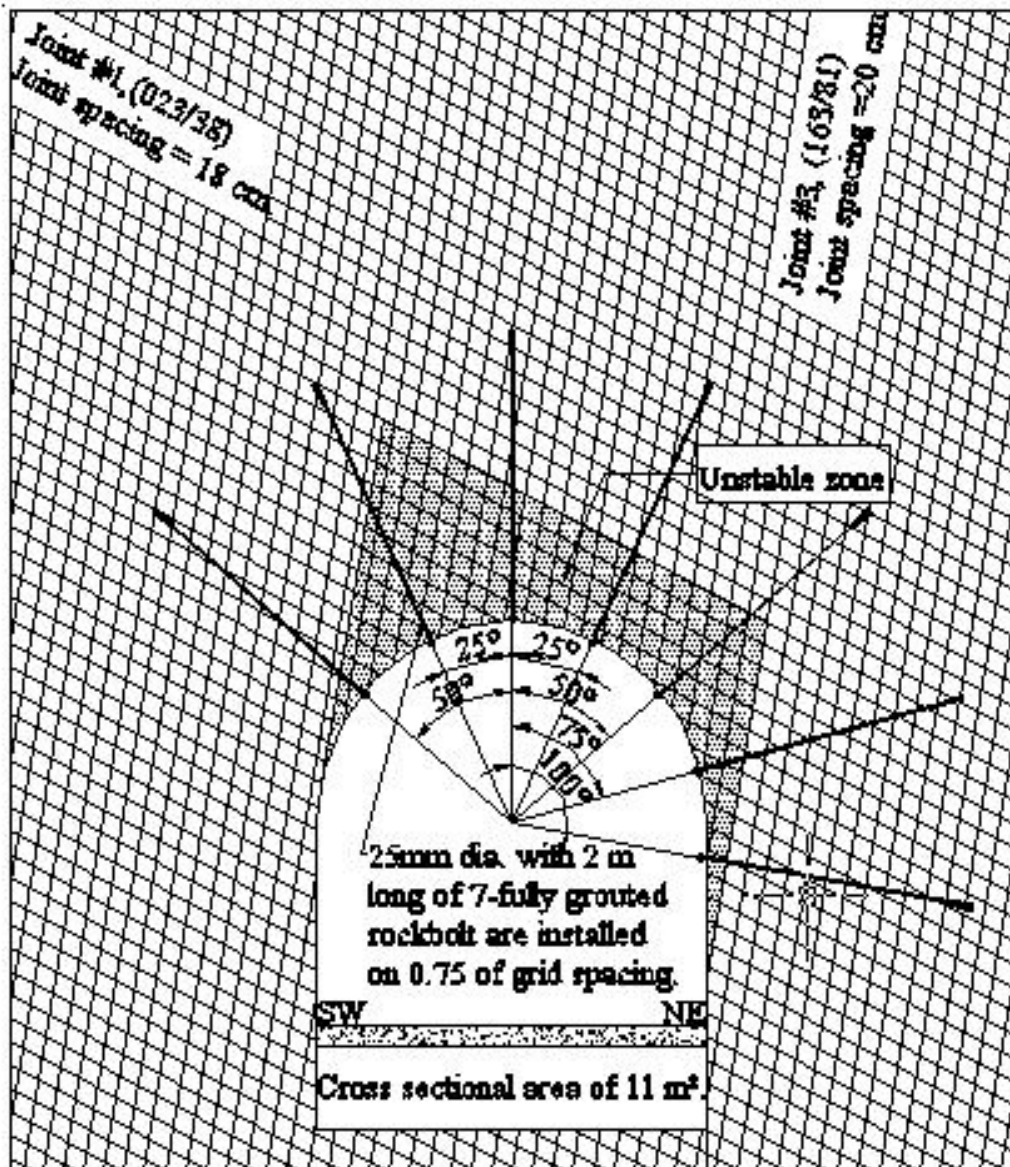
Preliminary layout of rockbolt pattern in sublevels in footwall low fracturing shale zone.
